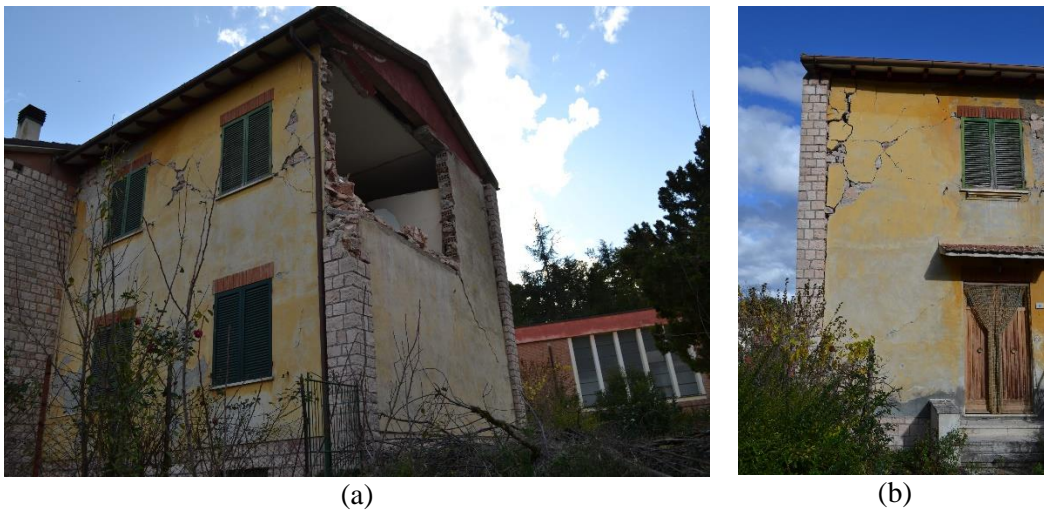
Main failure modes surveyed after the 2016 earthquake: (a) second-story OOP overturning of an end façade; (b) in-plane shear failure and onset of OOP overturning of the North-West façade [31].
